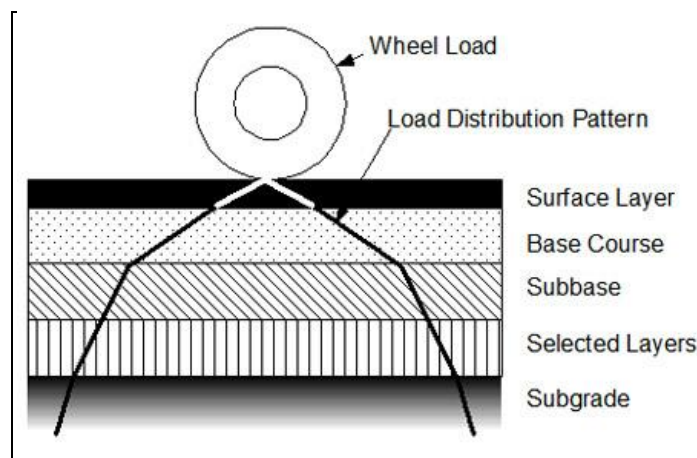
1 A Load Distribution Pattern in a Flexible Pavement [16]
